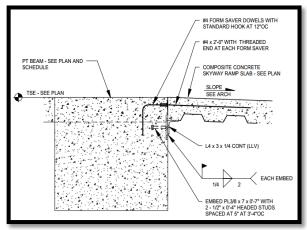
A section through the link bridge floor connection detail to the second floor
